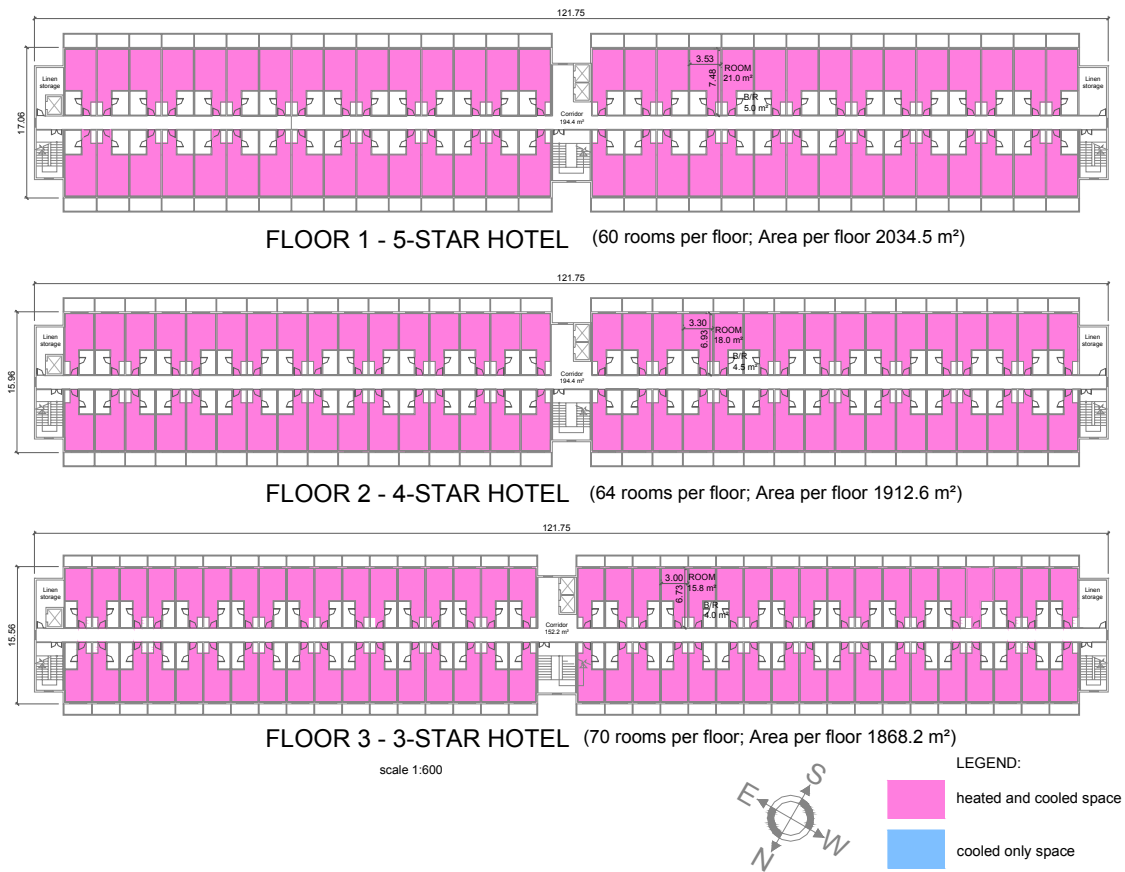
Floors 1-3 plan of the theoretical hotel
